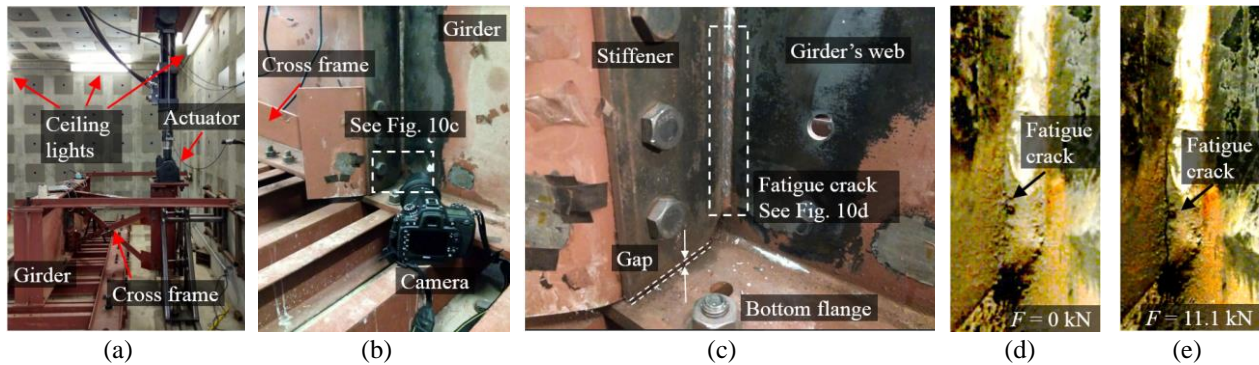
(a) Test model setup; (b) the girder to cross frame connection and camera setup; (c) detailed look of the crack prone region; (d) blow-up detail of fatigue crack when the applied load  $F$  is 0 kN; and (e) blow-up detail of fatigue crack when the applied load  $F$  is 11.1 kN. (The image brightness in Figure 59d and e is enhanced 100% for demonstration purpose)
